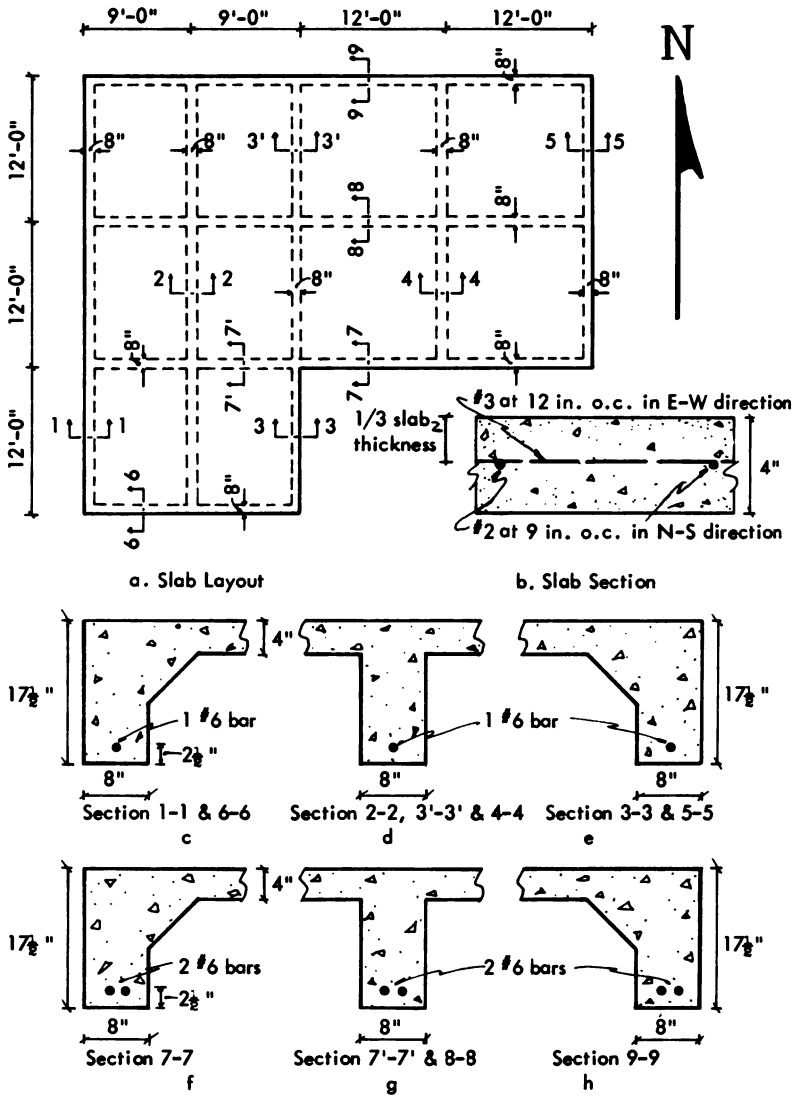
Slab Layout and Reinforcement—Para. 7.12 Design Example
